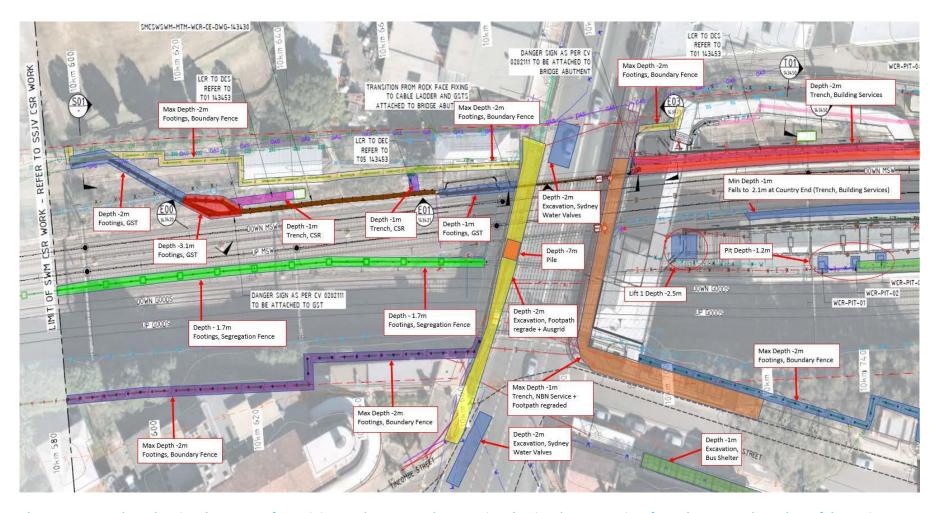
Plans showing the extent of remaining works at Canterbury Station that involve excavation, from the eastern boundary of the project to part-way through the railway station (Source: HSEJV 2021)
